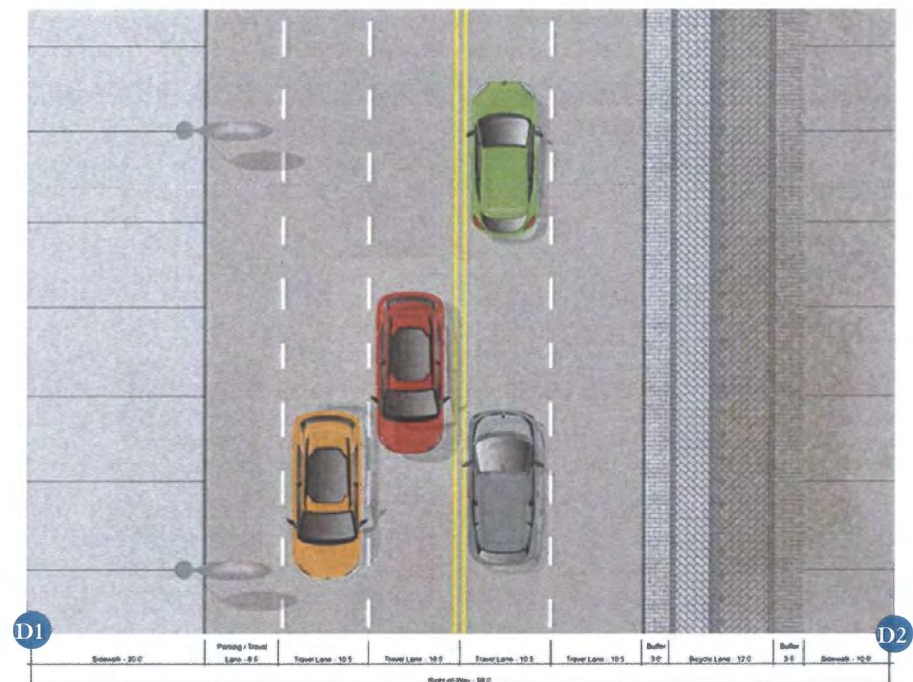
Lakeside Avenue between E Mall Dr and W Mall Dr Zoomed-In Plan
